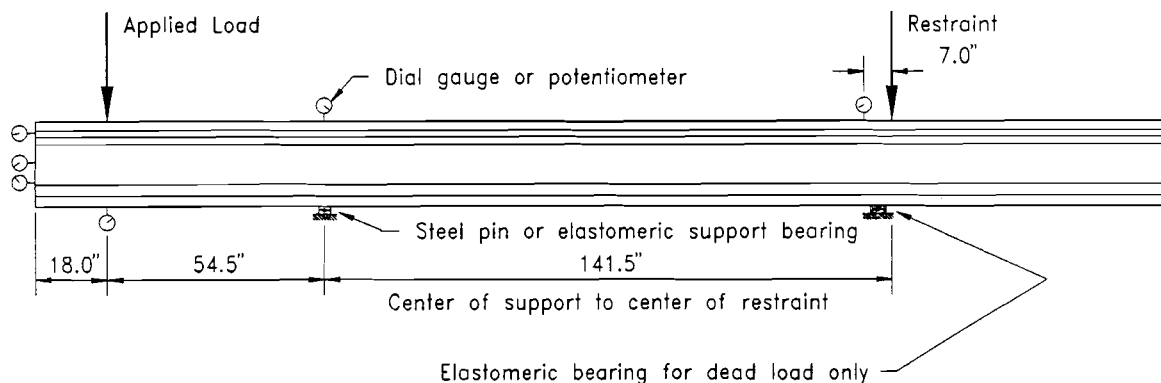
Loading arrangement showing deflection and strand slip measurement locations.
